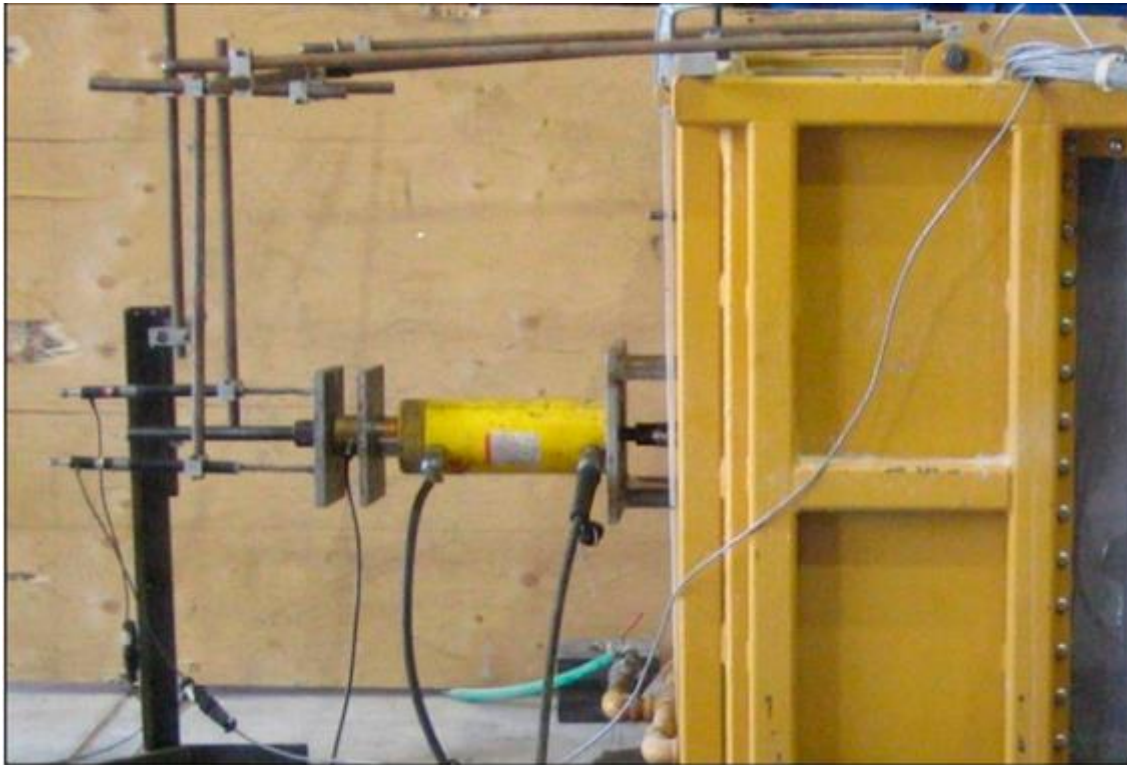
26 Pullout testing of soil nails at 90° to vertical (Gurpersaud et al. [57])
